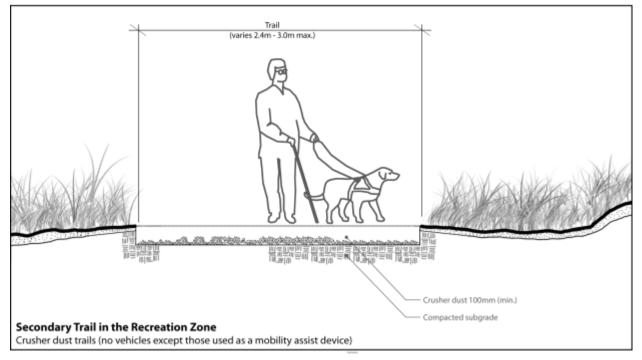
Cross Section of a Secondary Trail in the Recreation Zone
